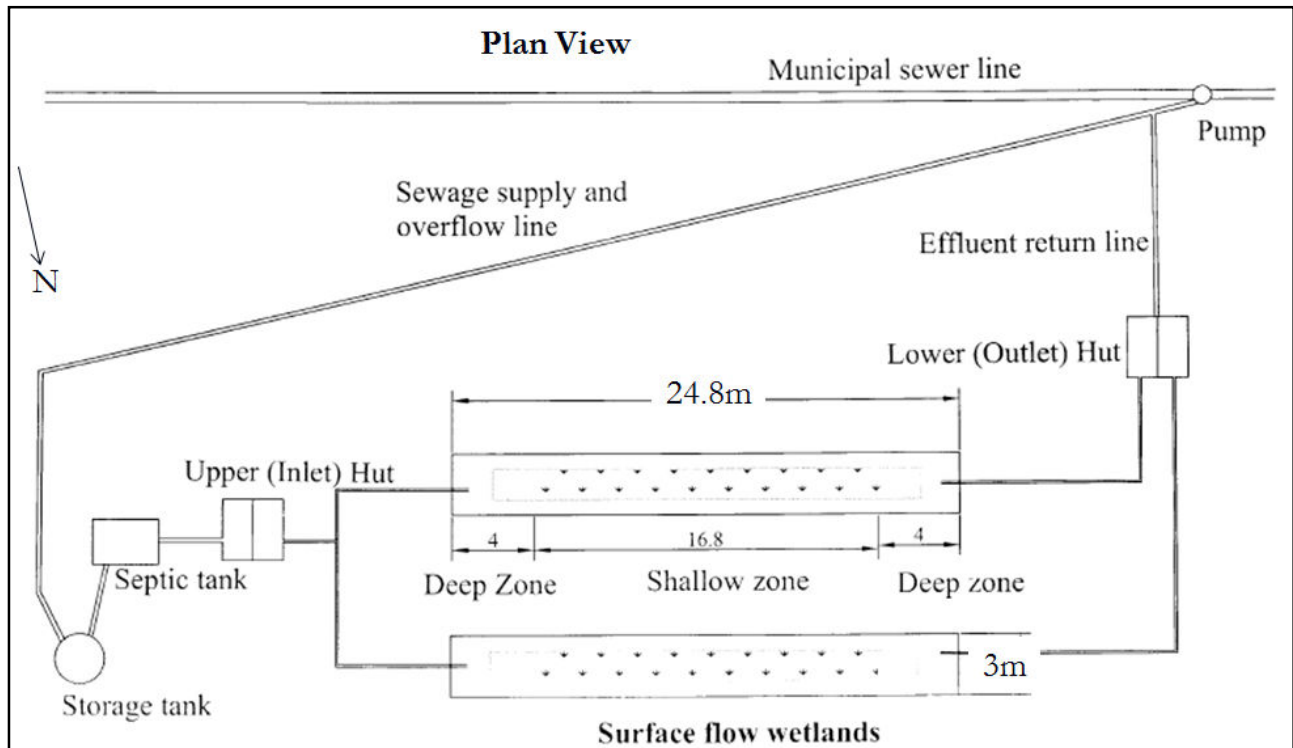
Plan View of Bible Hill Domestic Wastewater Treatment Wetland system
